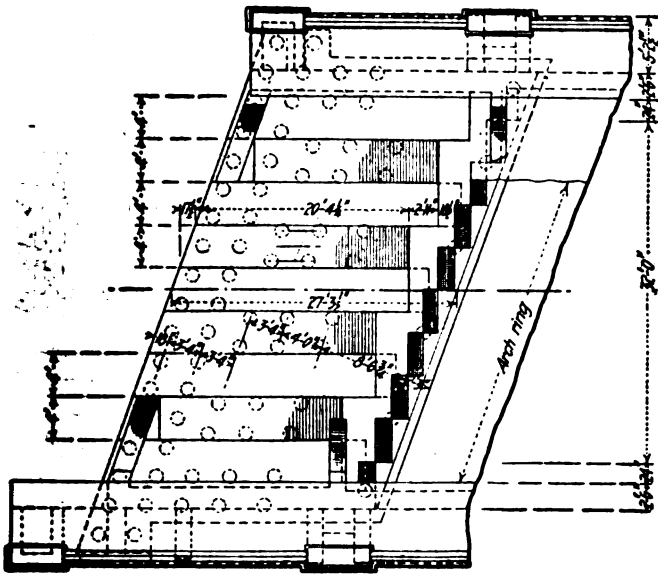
PLAN OF ABUTMENT SHOWING PILE GROUPING
